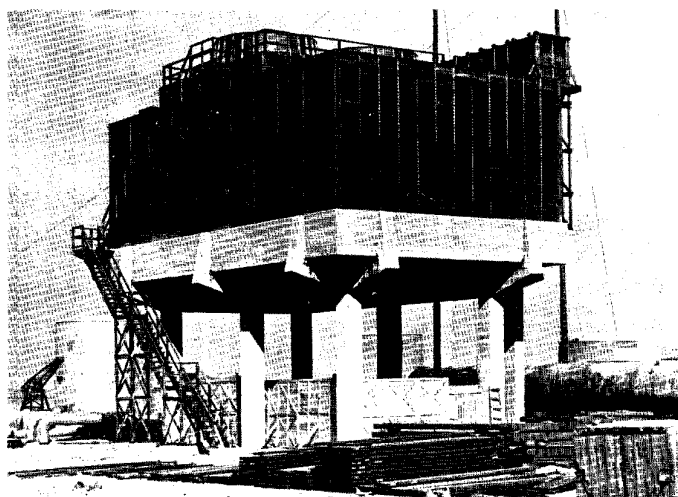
DEGASIFYING TOWER F-2, VIEW LOOKING N
